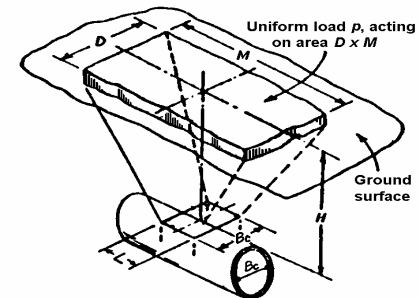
P-1 - Live and Dead Loads on Pipe Installed Under Railroads (ACPA, 1981)
